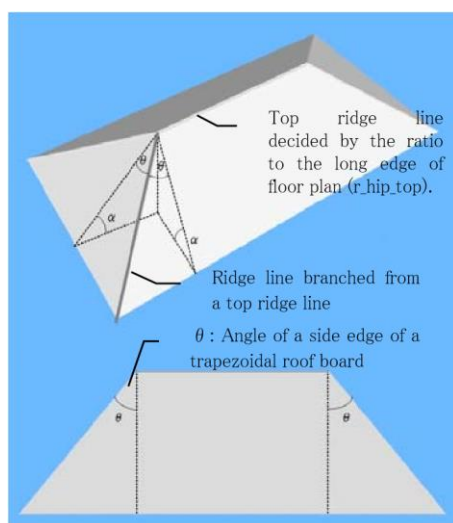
The slope of the roof (α) and angle (θ) of a side edge of a trapezoidal roof board
